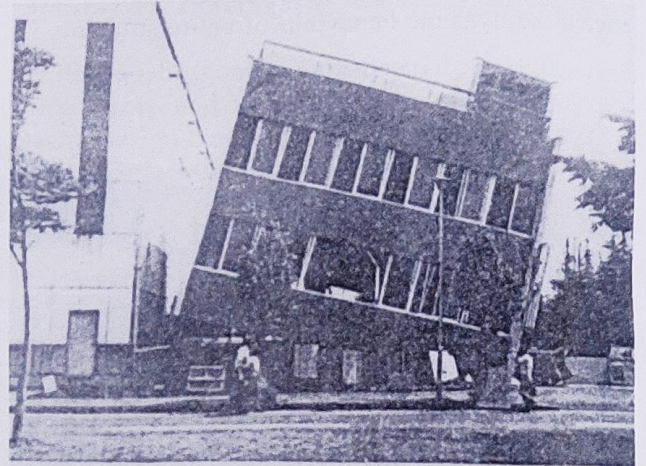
Obisan Building Oroshicho area, Sendai: view from the south. The upper stories rotated as a rigid body when the first-floor column support was lost.
